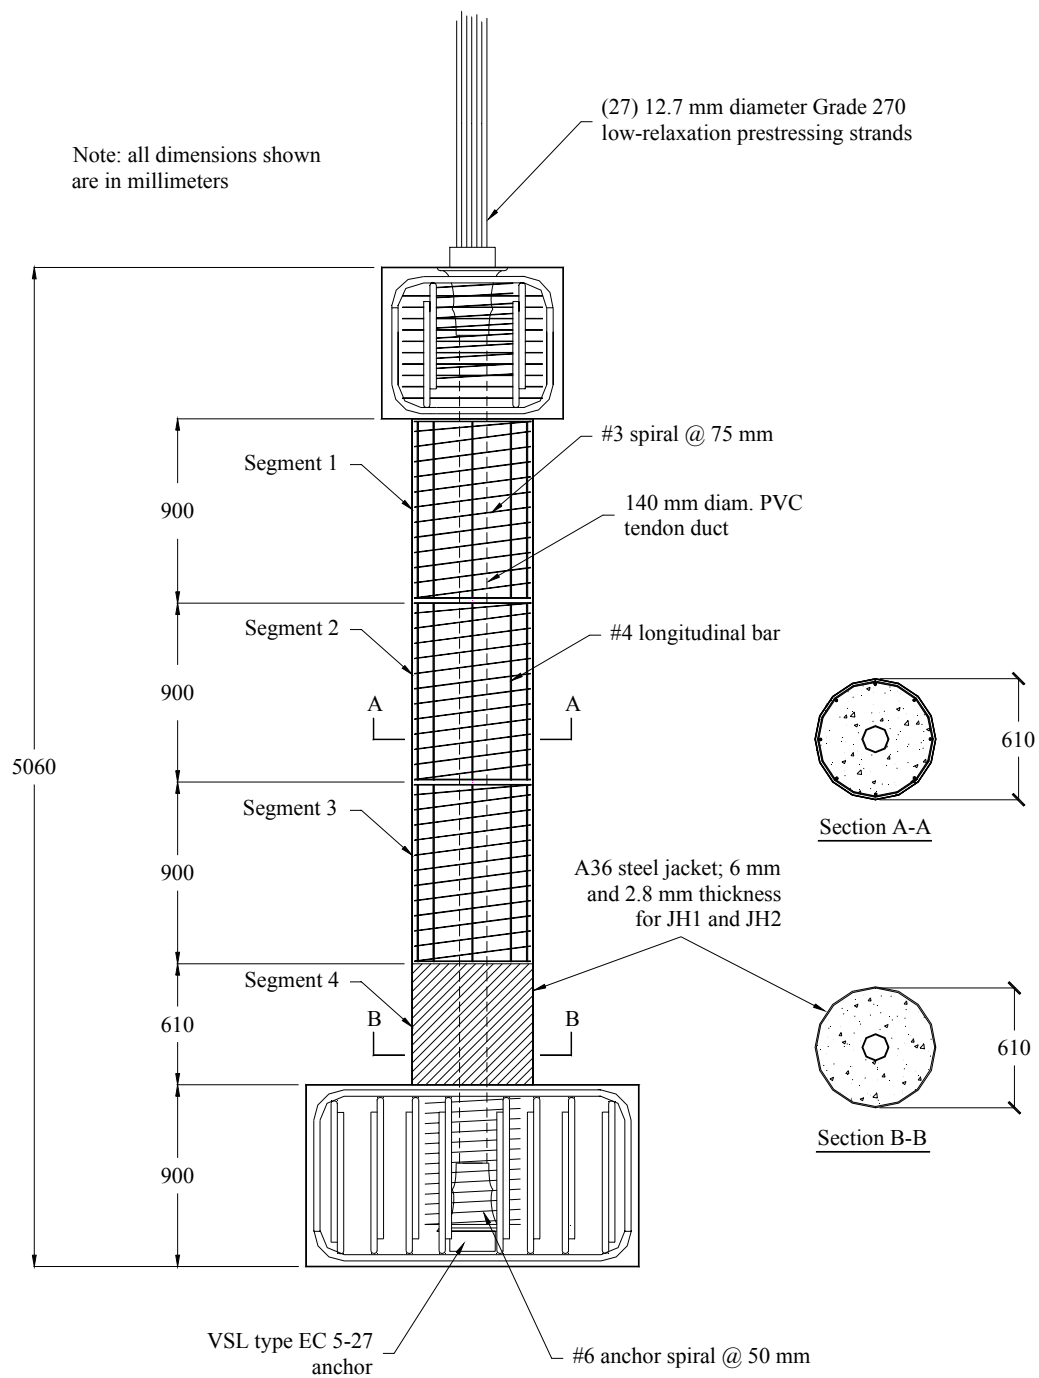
Test unit JH1 and JH2 column reinforcement details
